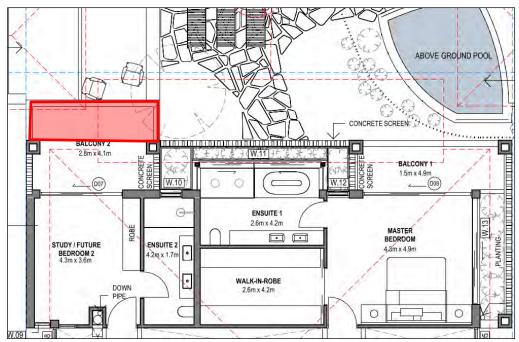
The area outlined in red shows the extent of balcony to be deleted (extract from the submitted architectural plans - first floor plan).
